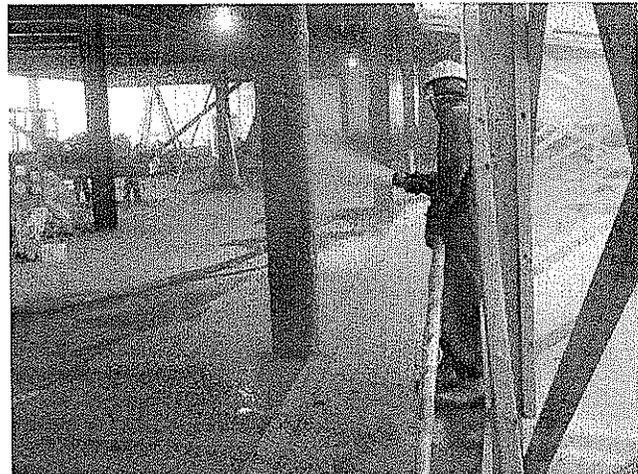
View west on the 3rd floor of segment F. February 11, 2011.
